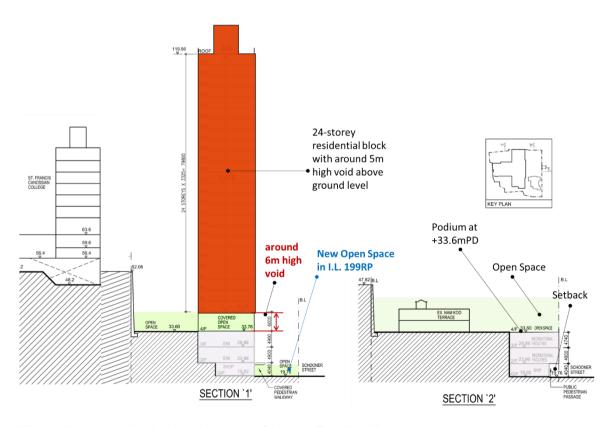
Indicative Development Scheme Section Plan
